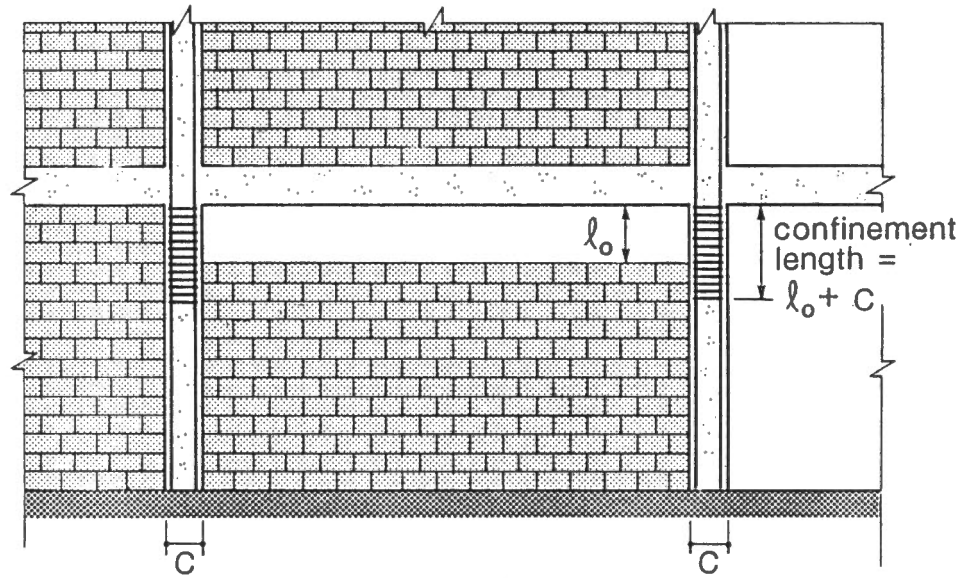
Additional Confinement Requirement for Columns in Contact with Masonry Walls (Adapted from Ref. 5.2)
